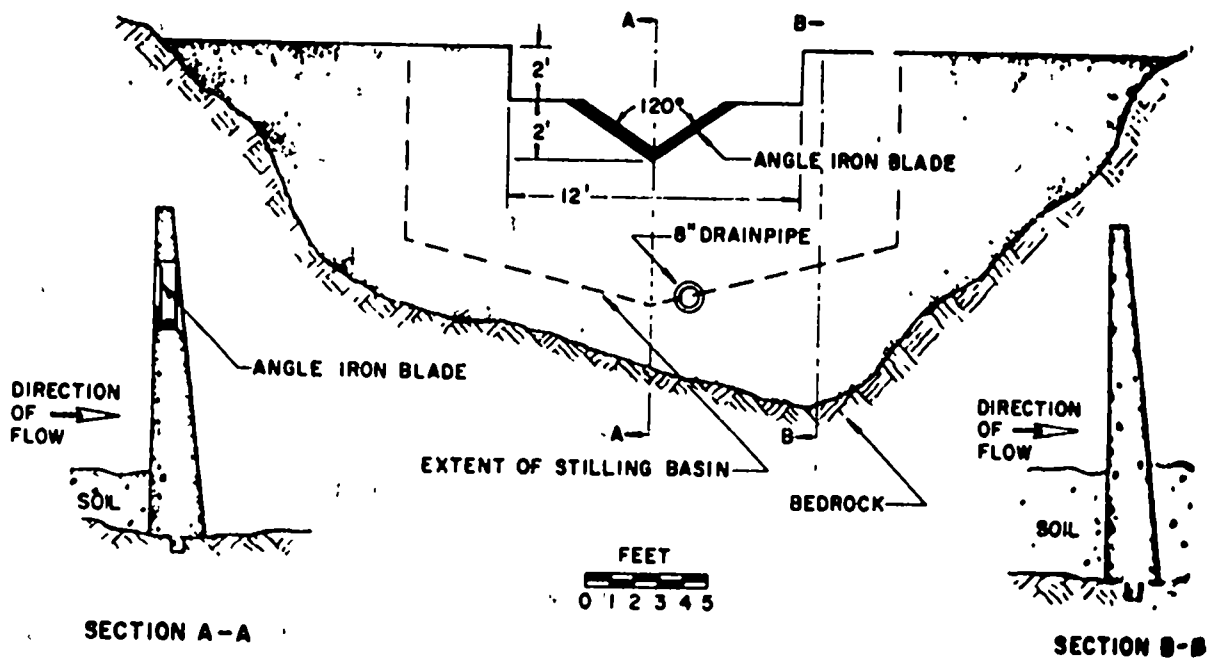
Schematic diagram of 120° V-notch weir, watertight design.
